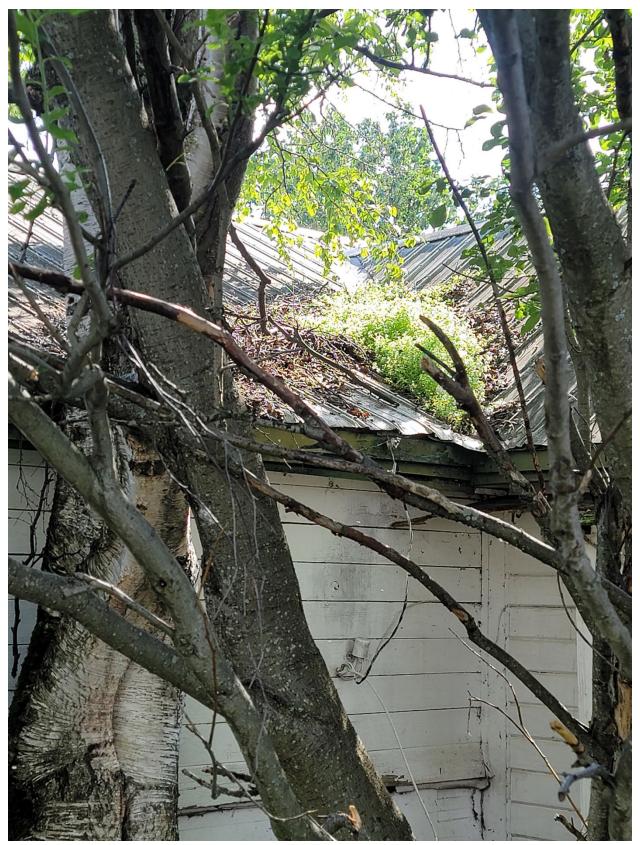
Detail photograph of the junction of the two sections of Building B. The photograph shows the roofing material, surrounding vegetation, and the vegetative debris growing on the roof valley (©TNSDS 2023).
